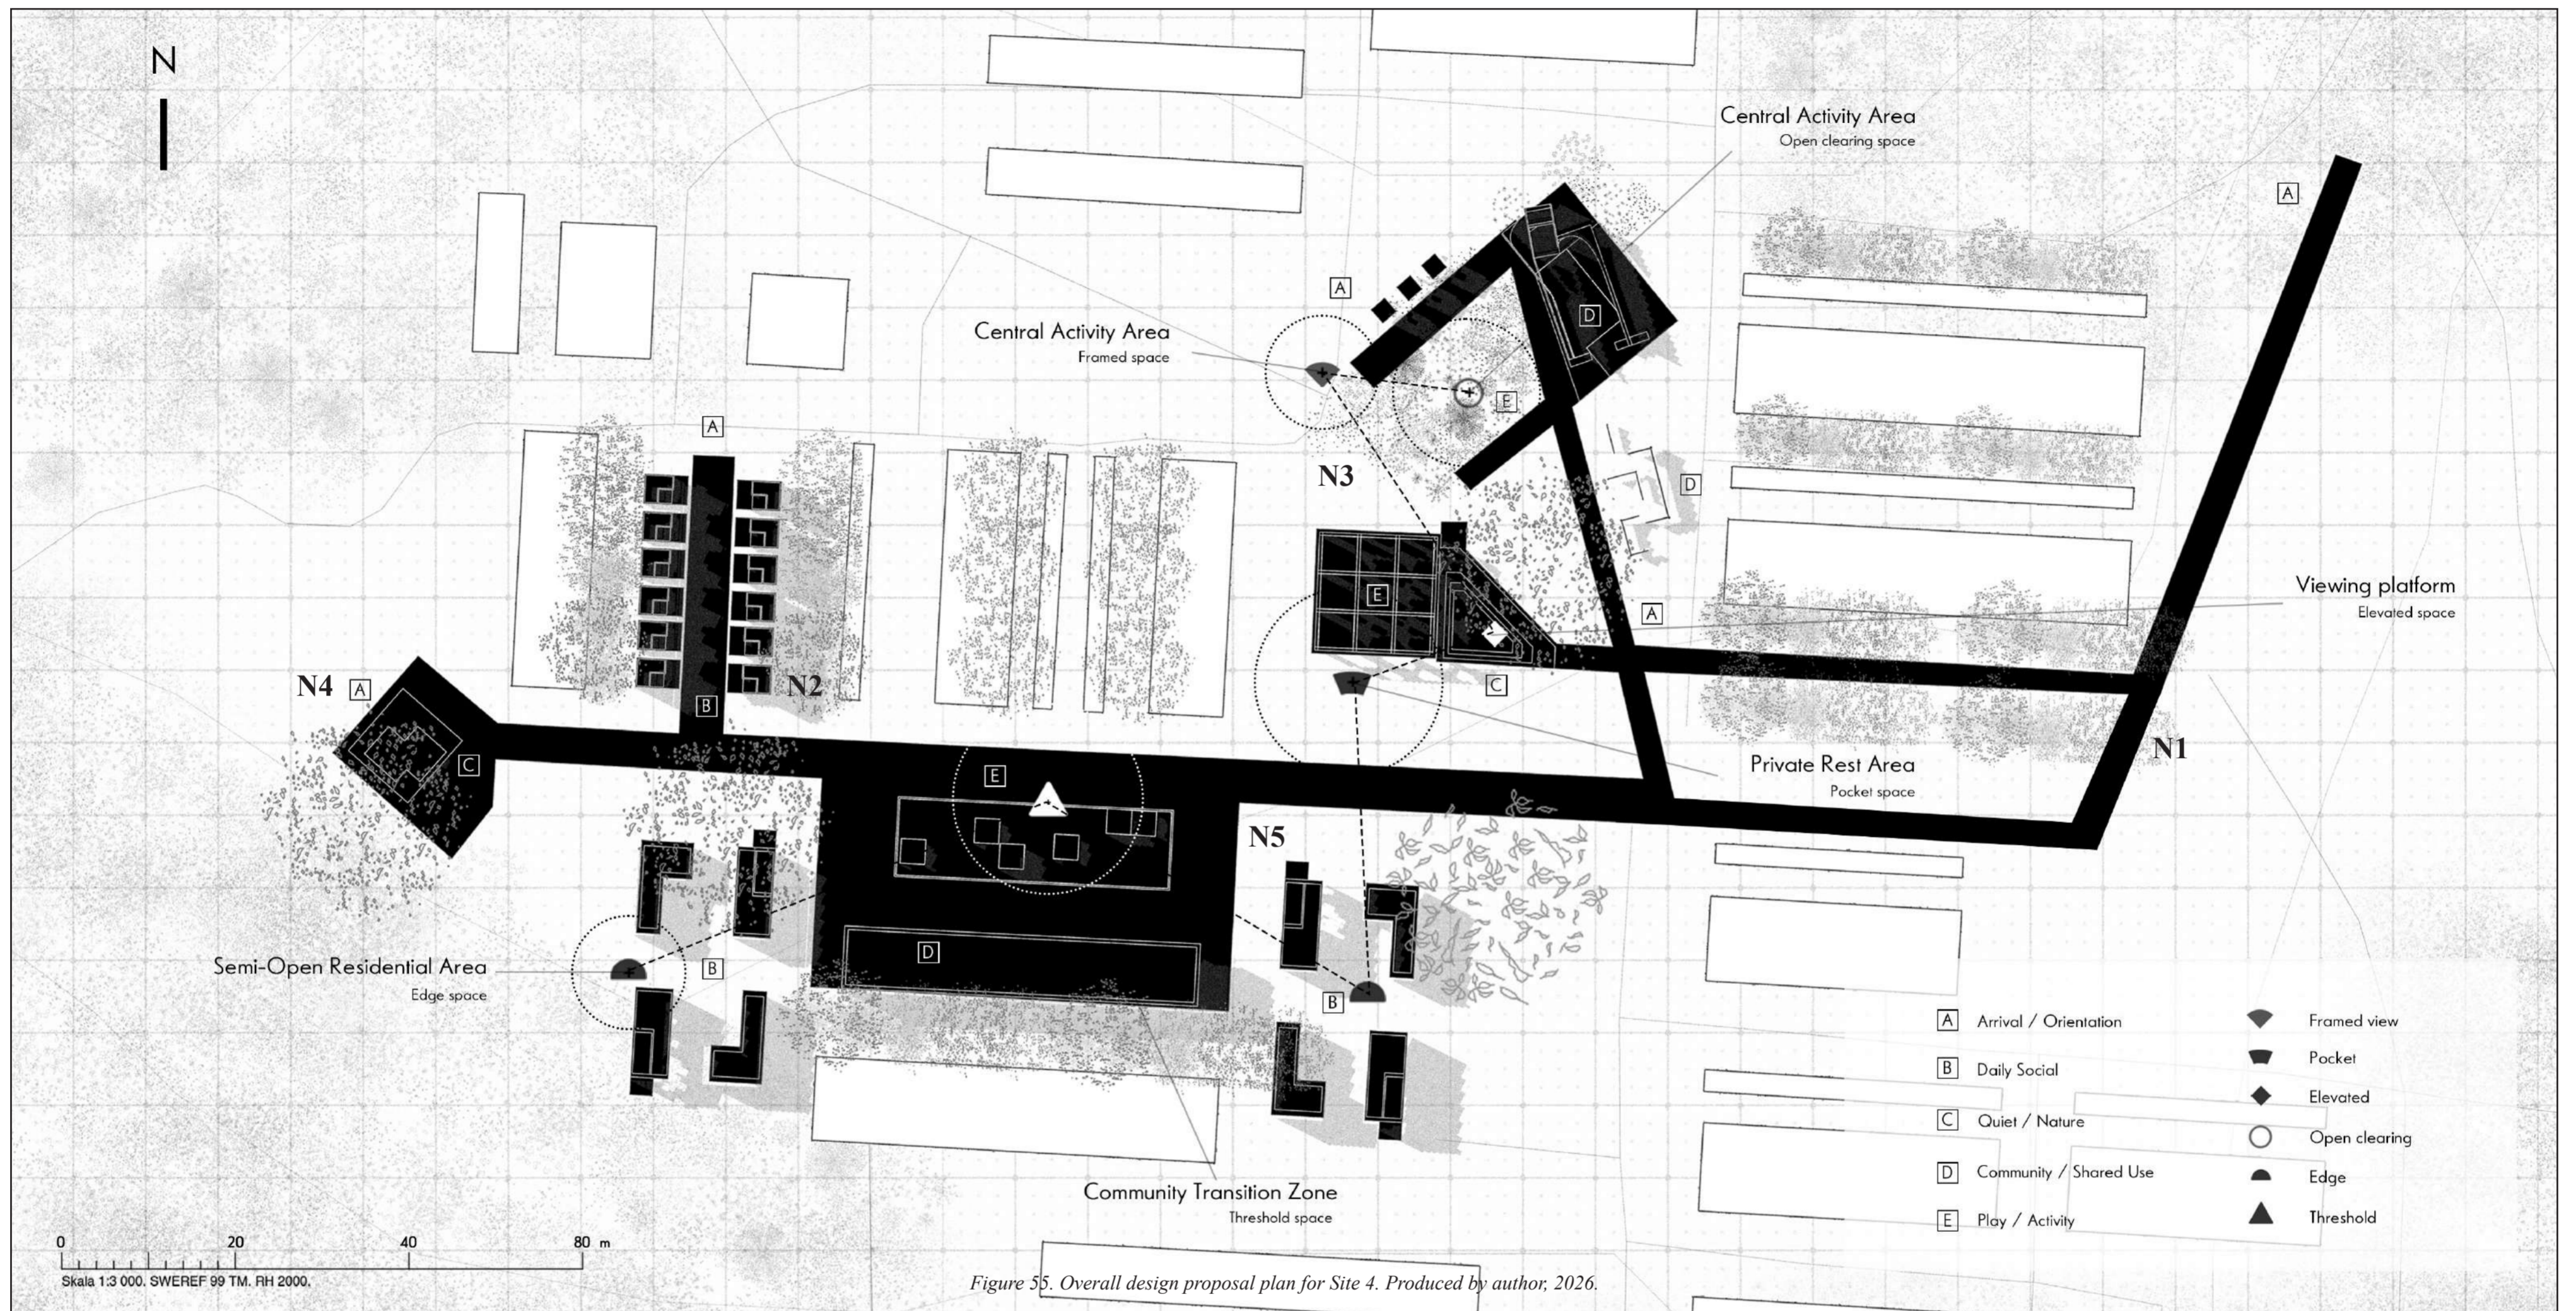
Overall design proposal plan for Site 4. Produced by author; 2026.
